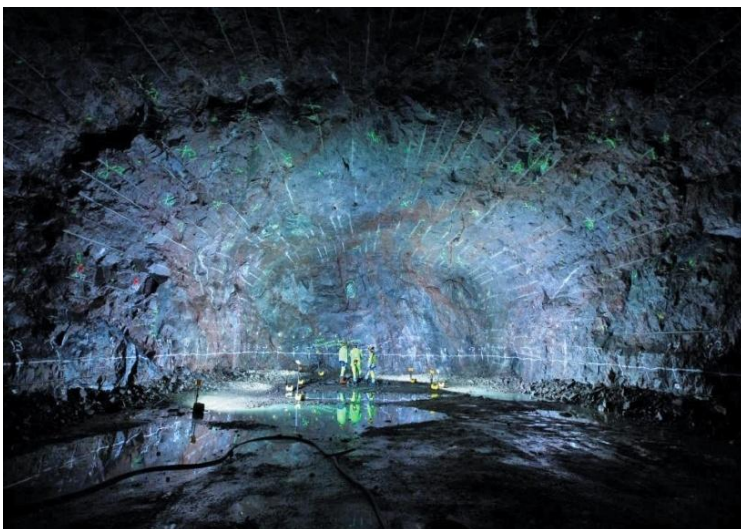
Tunnel TAS08 where K08028F01 was drilled in the tunnel face. Photo from SKB (2013).
